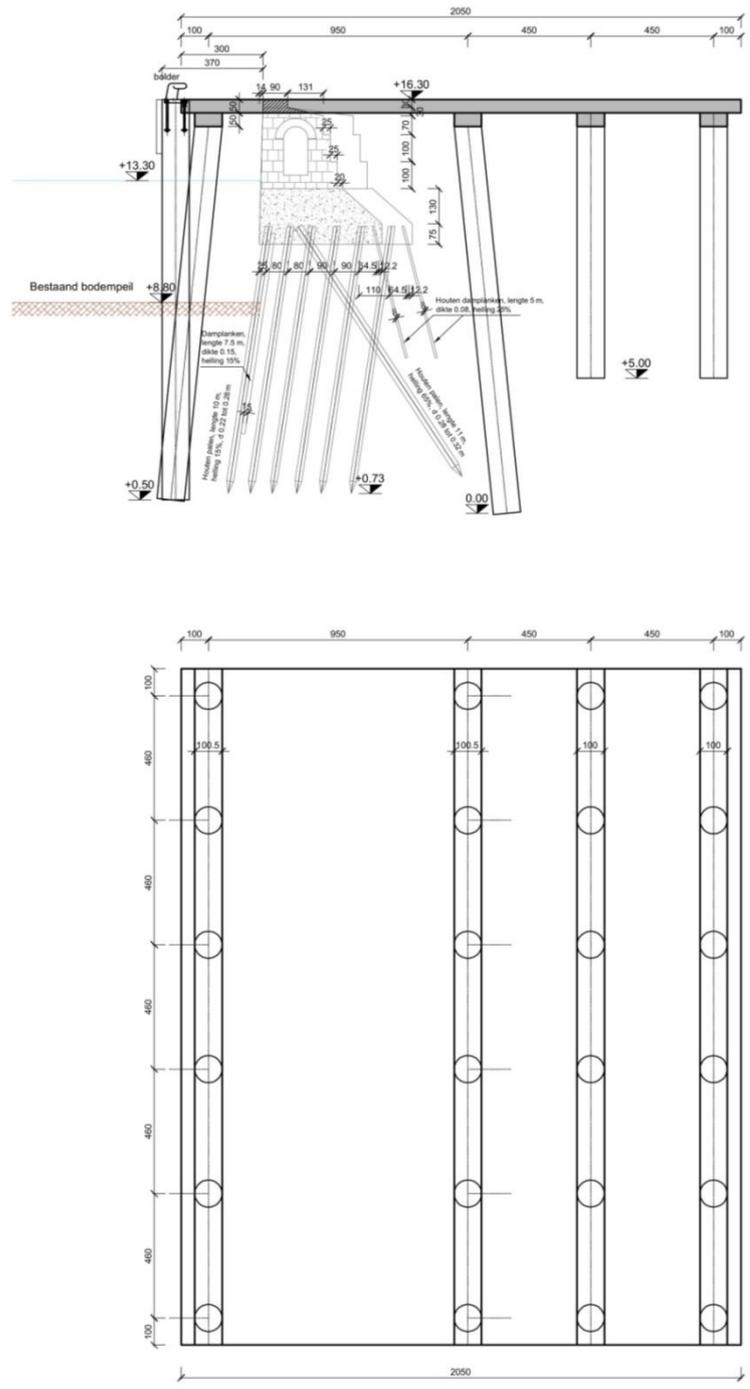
Vergote Dock – reinforced quay wall – loading/unloading area – 40 kN/m² mobile load – reduced platform 25m x 20.5m (source: Technum)
